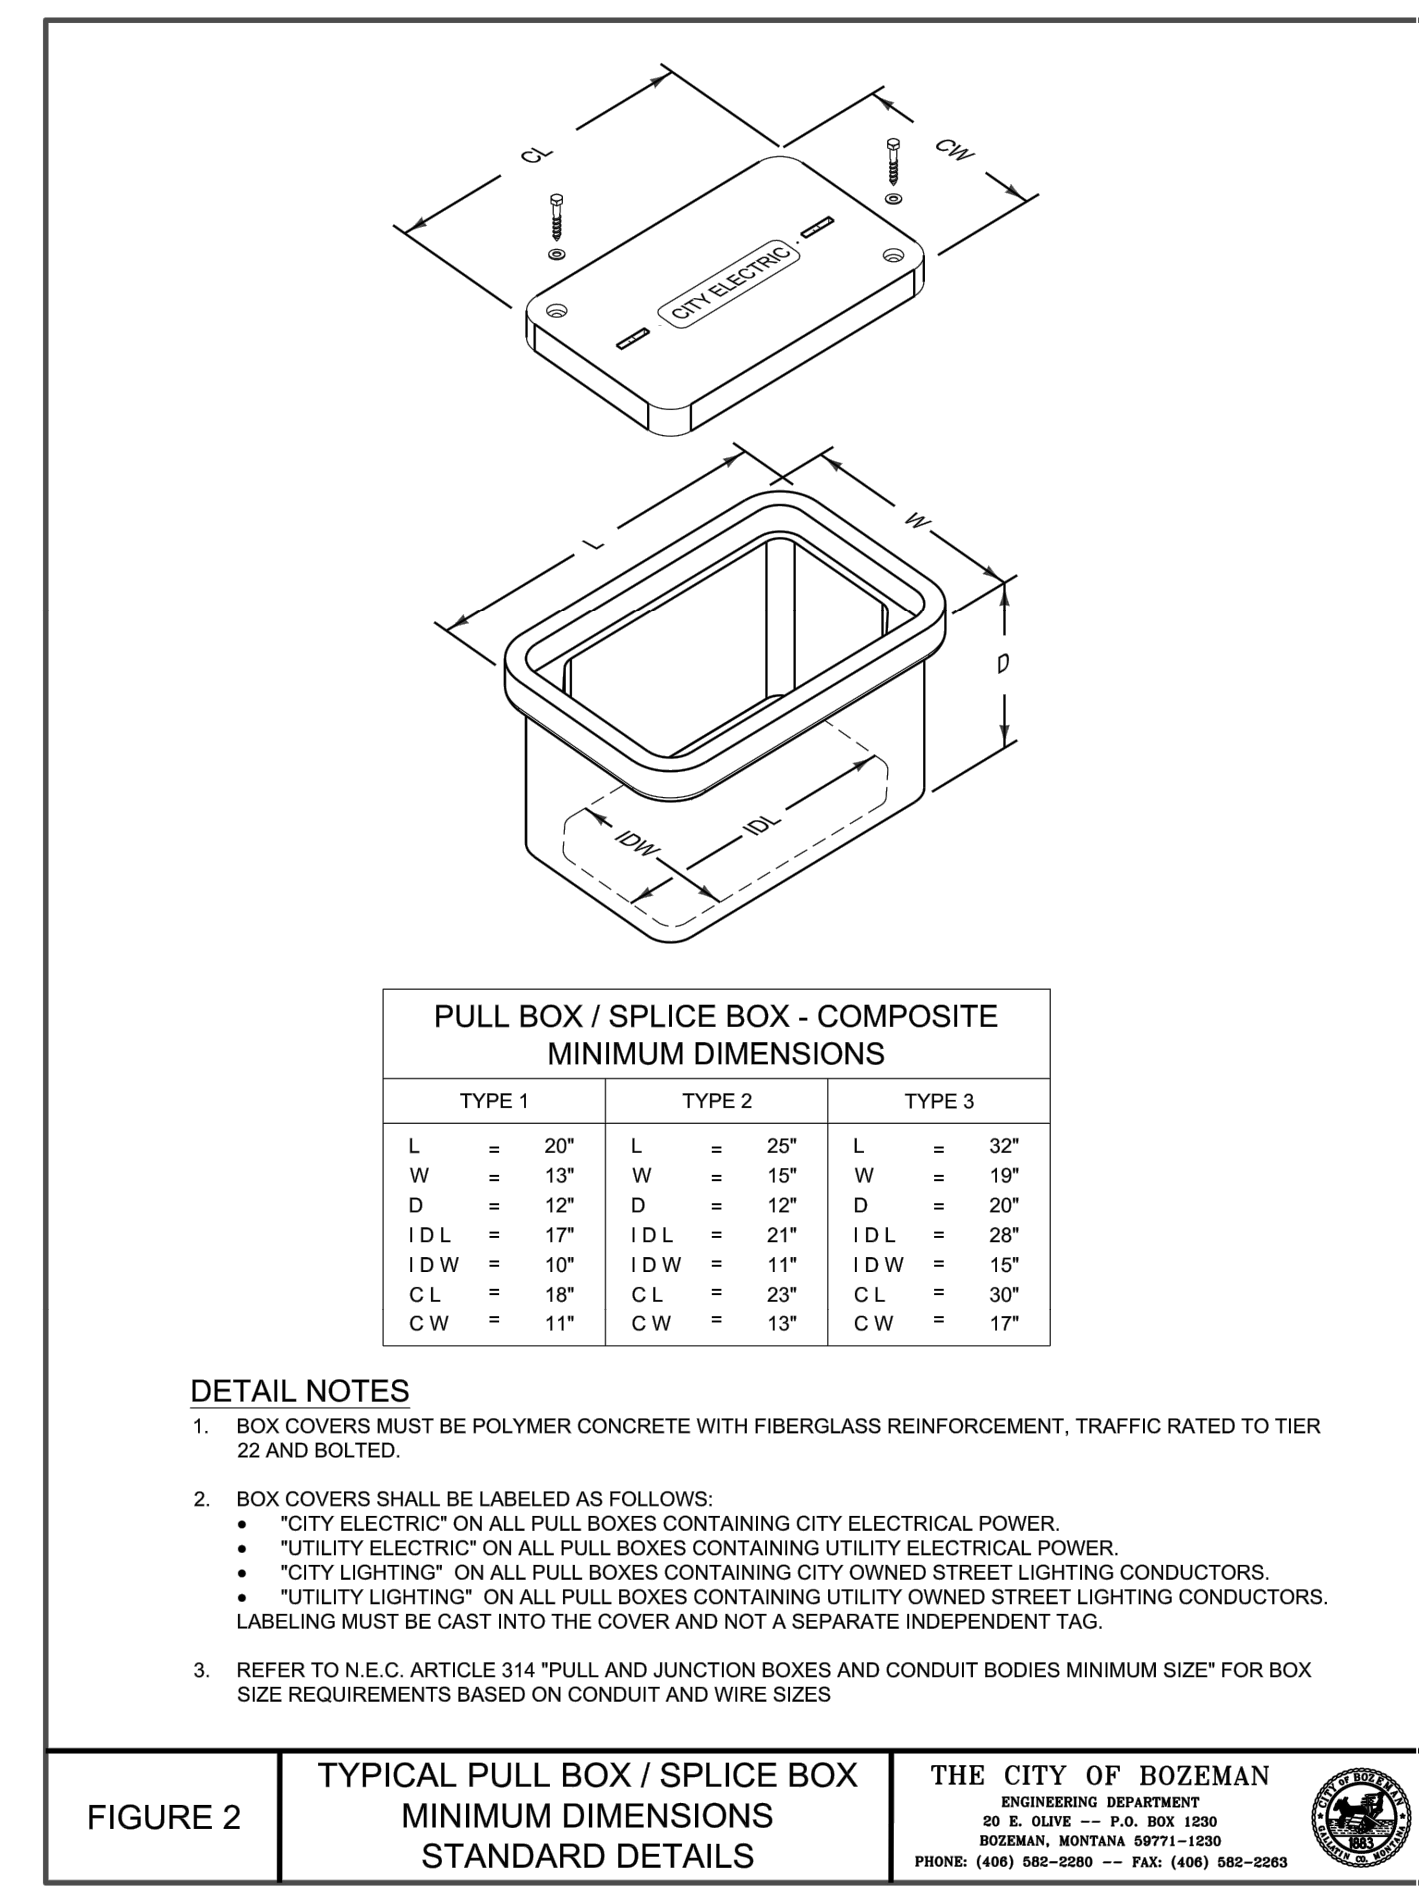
TYPICAL PULL BOX / SPLICE BOX MINIMUM DIMENSIONS STANDARD DETAILS
